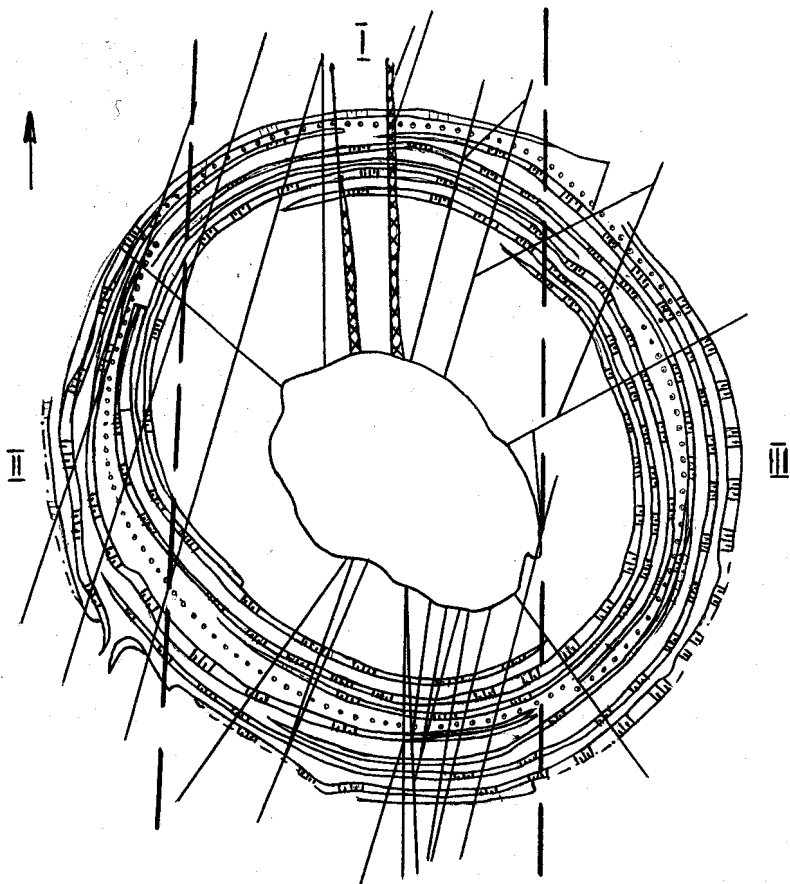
Structural features encountered in the Mir diamond open pit and location plan of counter-filtration curtain around the pit
